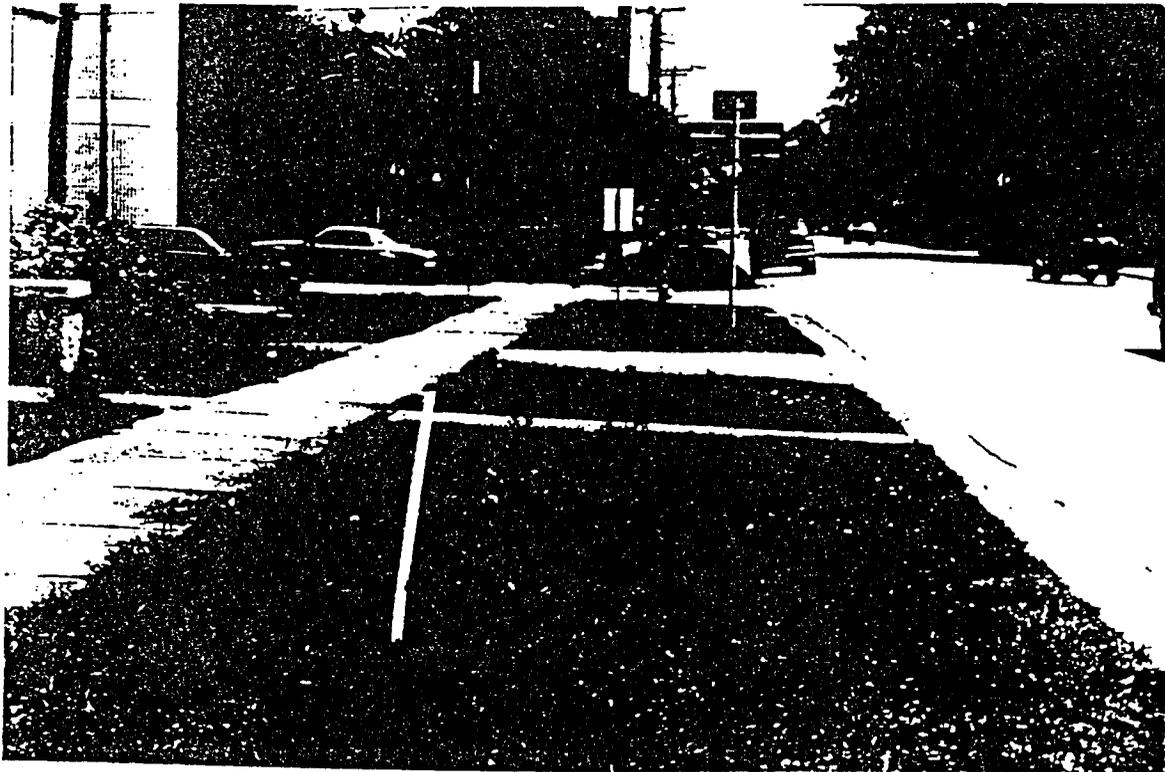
A view of the south side of SR 100 facing east at the Holden House.
